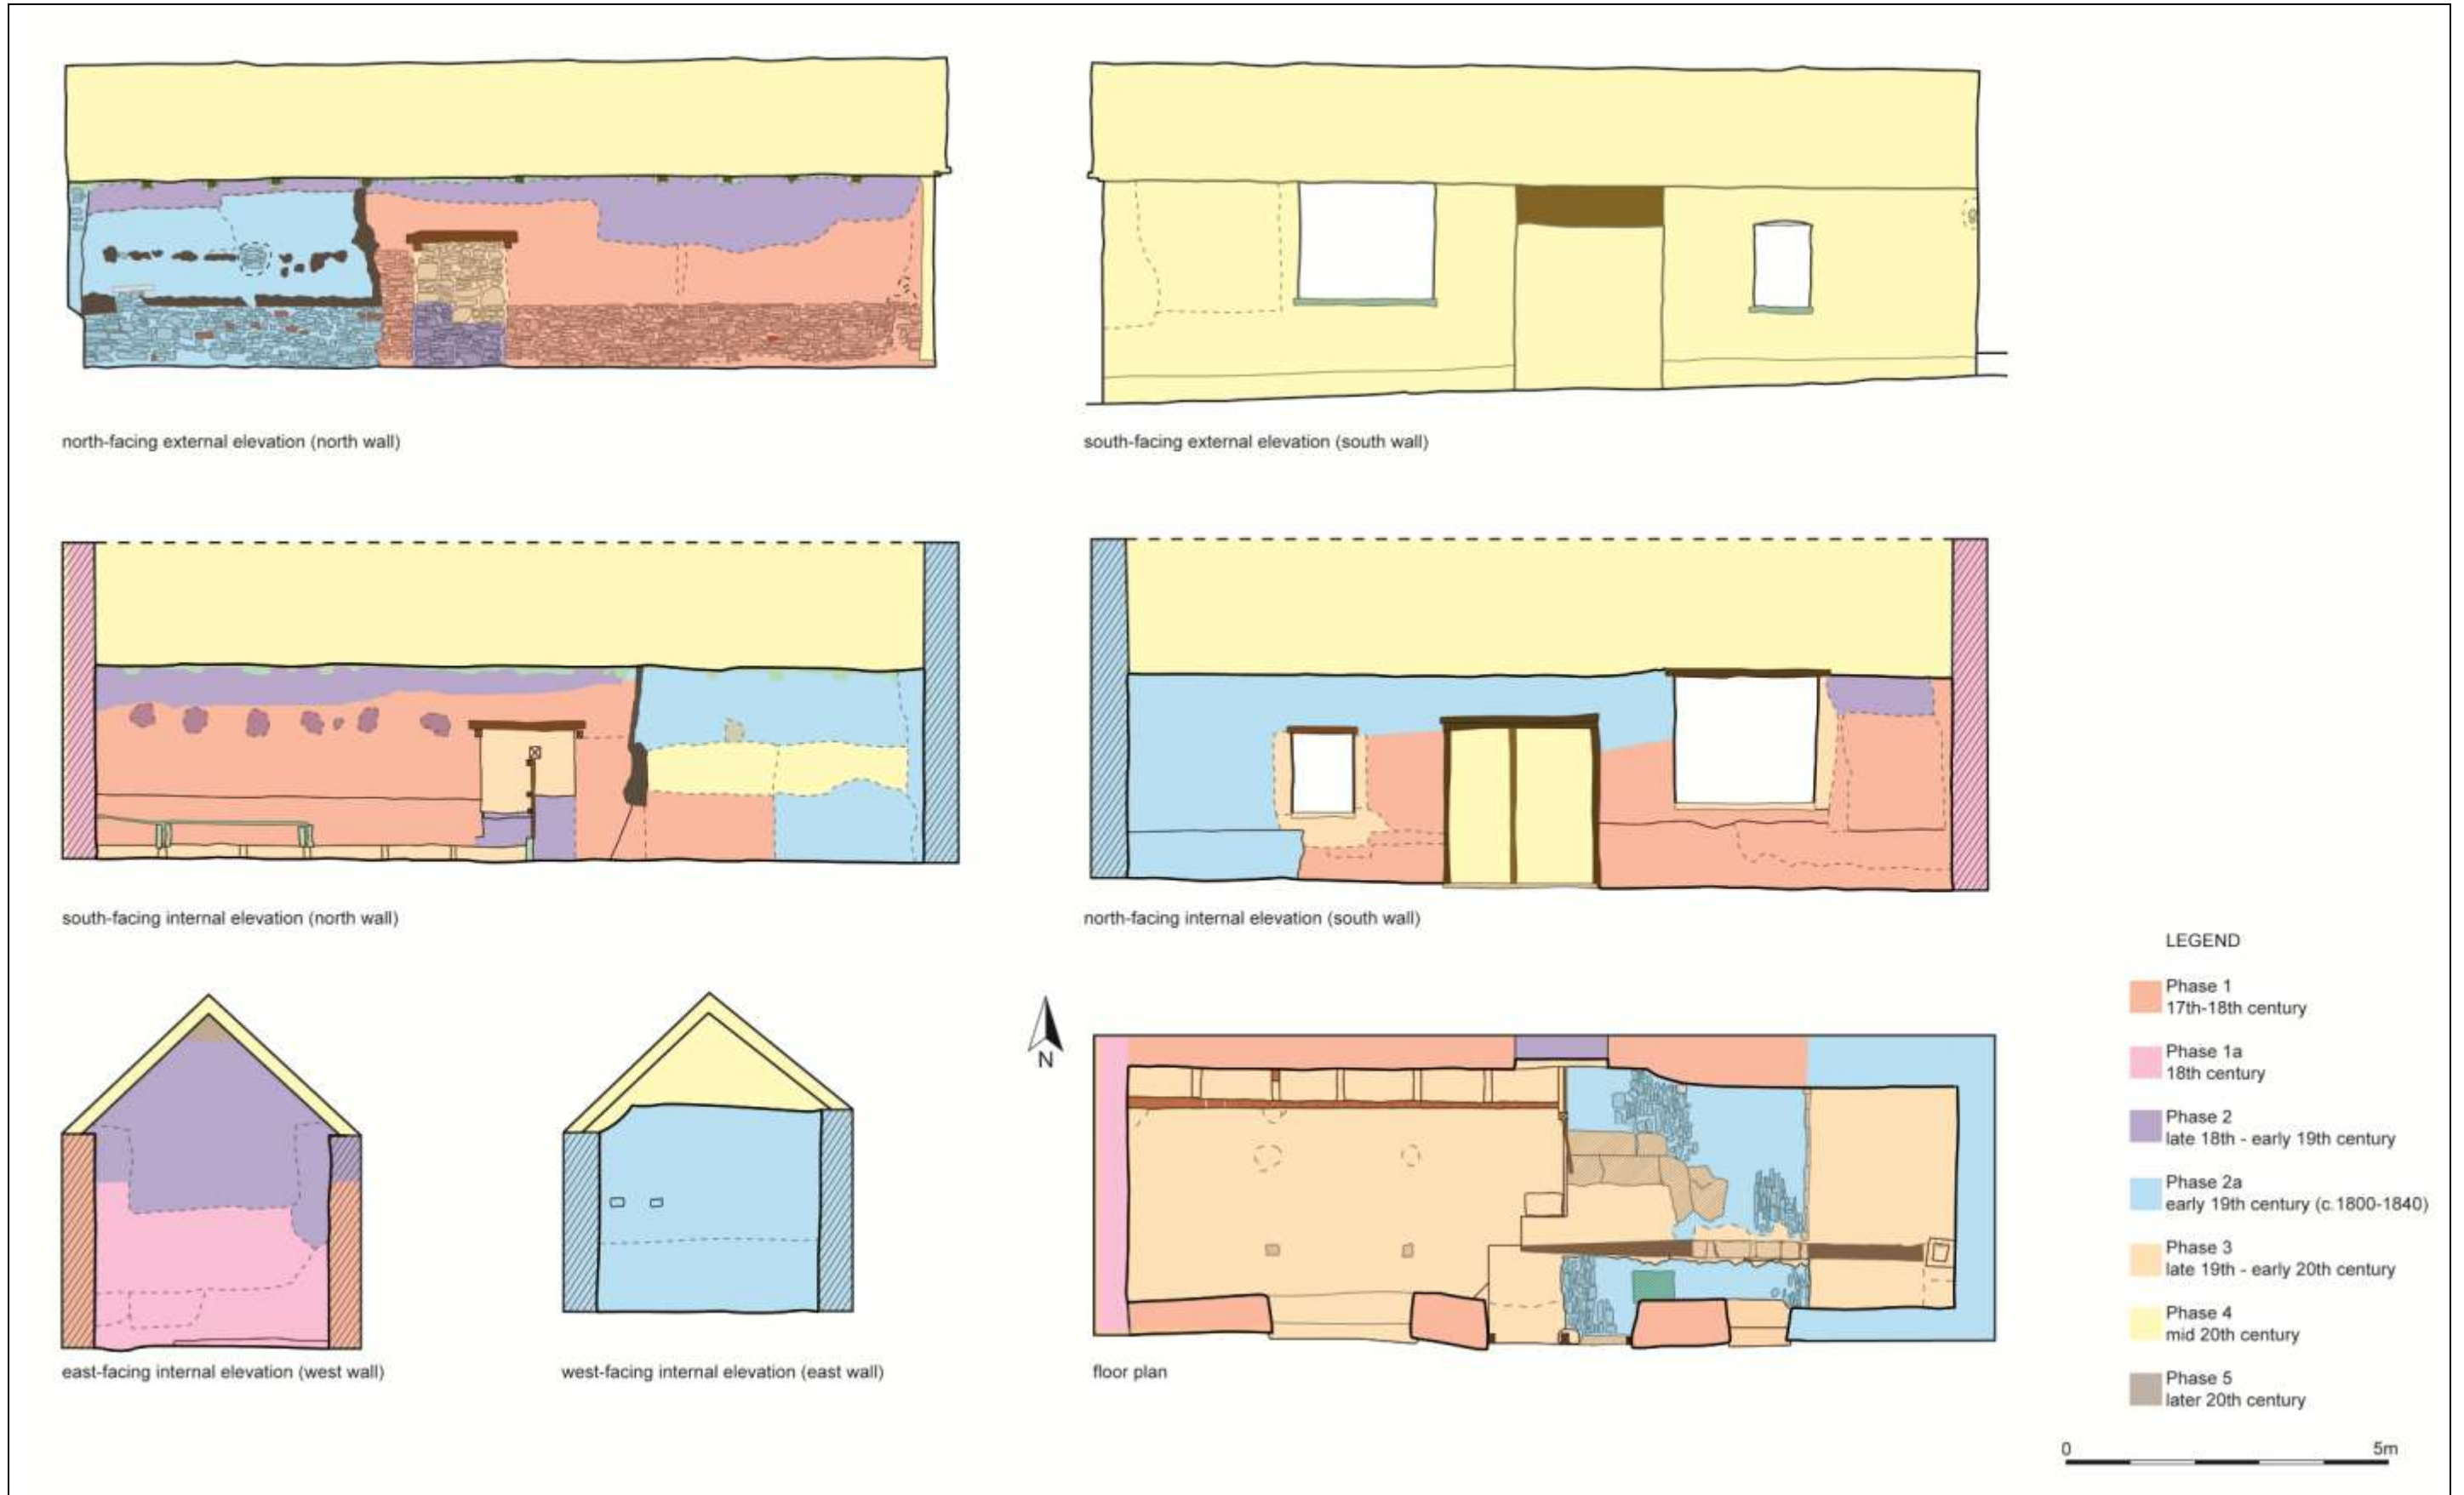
PHASED ELEVATION AND PLAN DRAWINGS OF B1.
